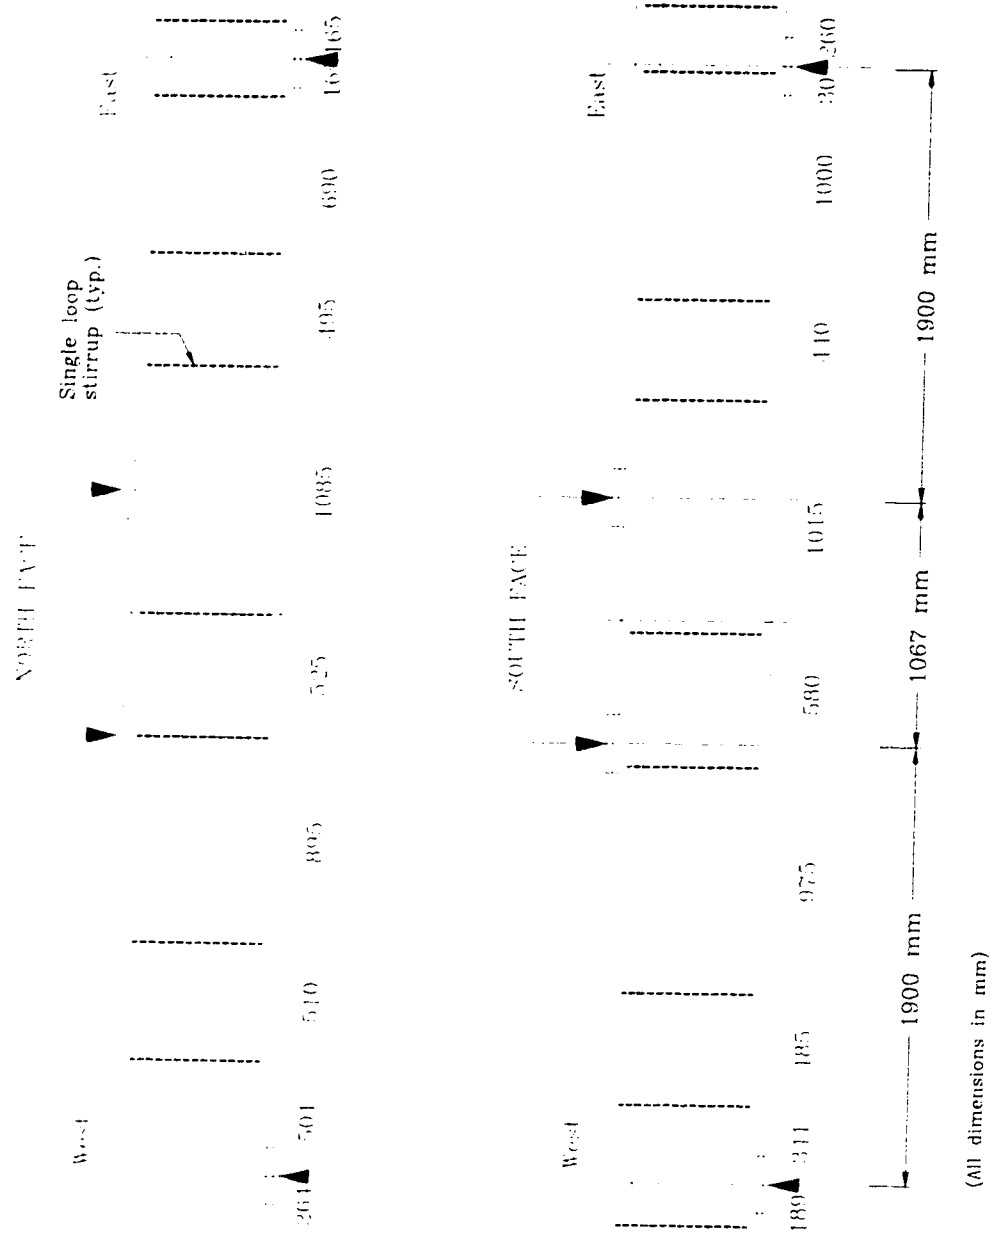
Girders 1 and 2 - Test set-up and stirrup locations
